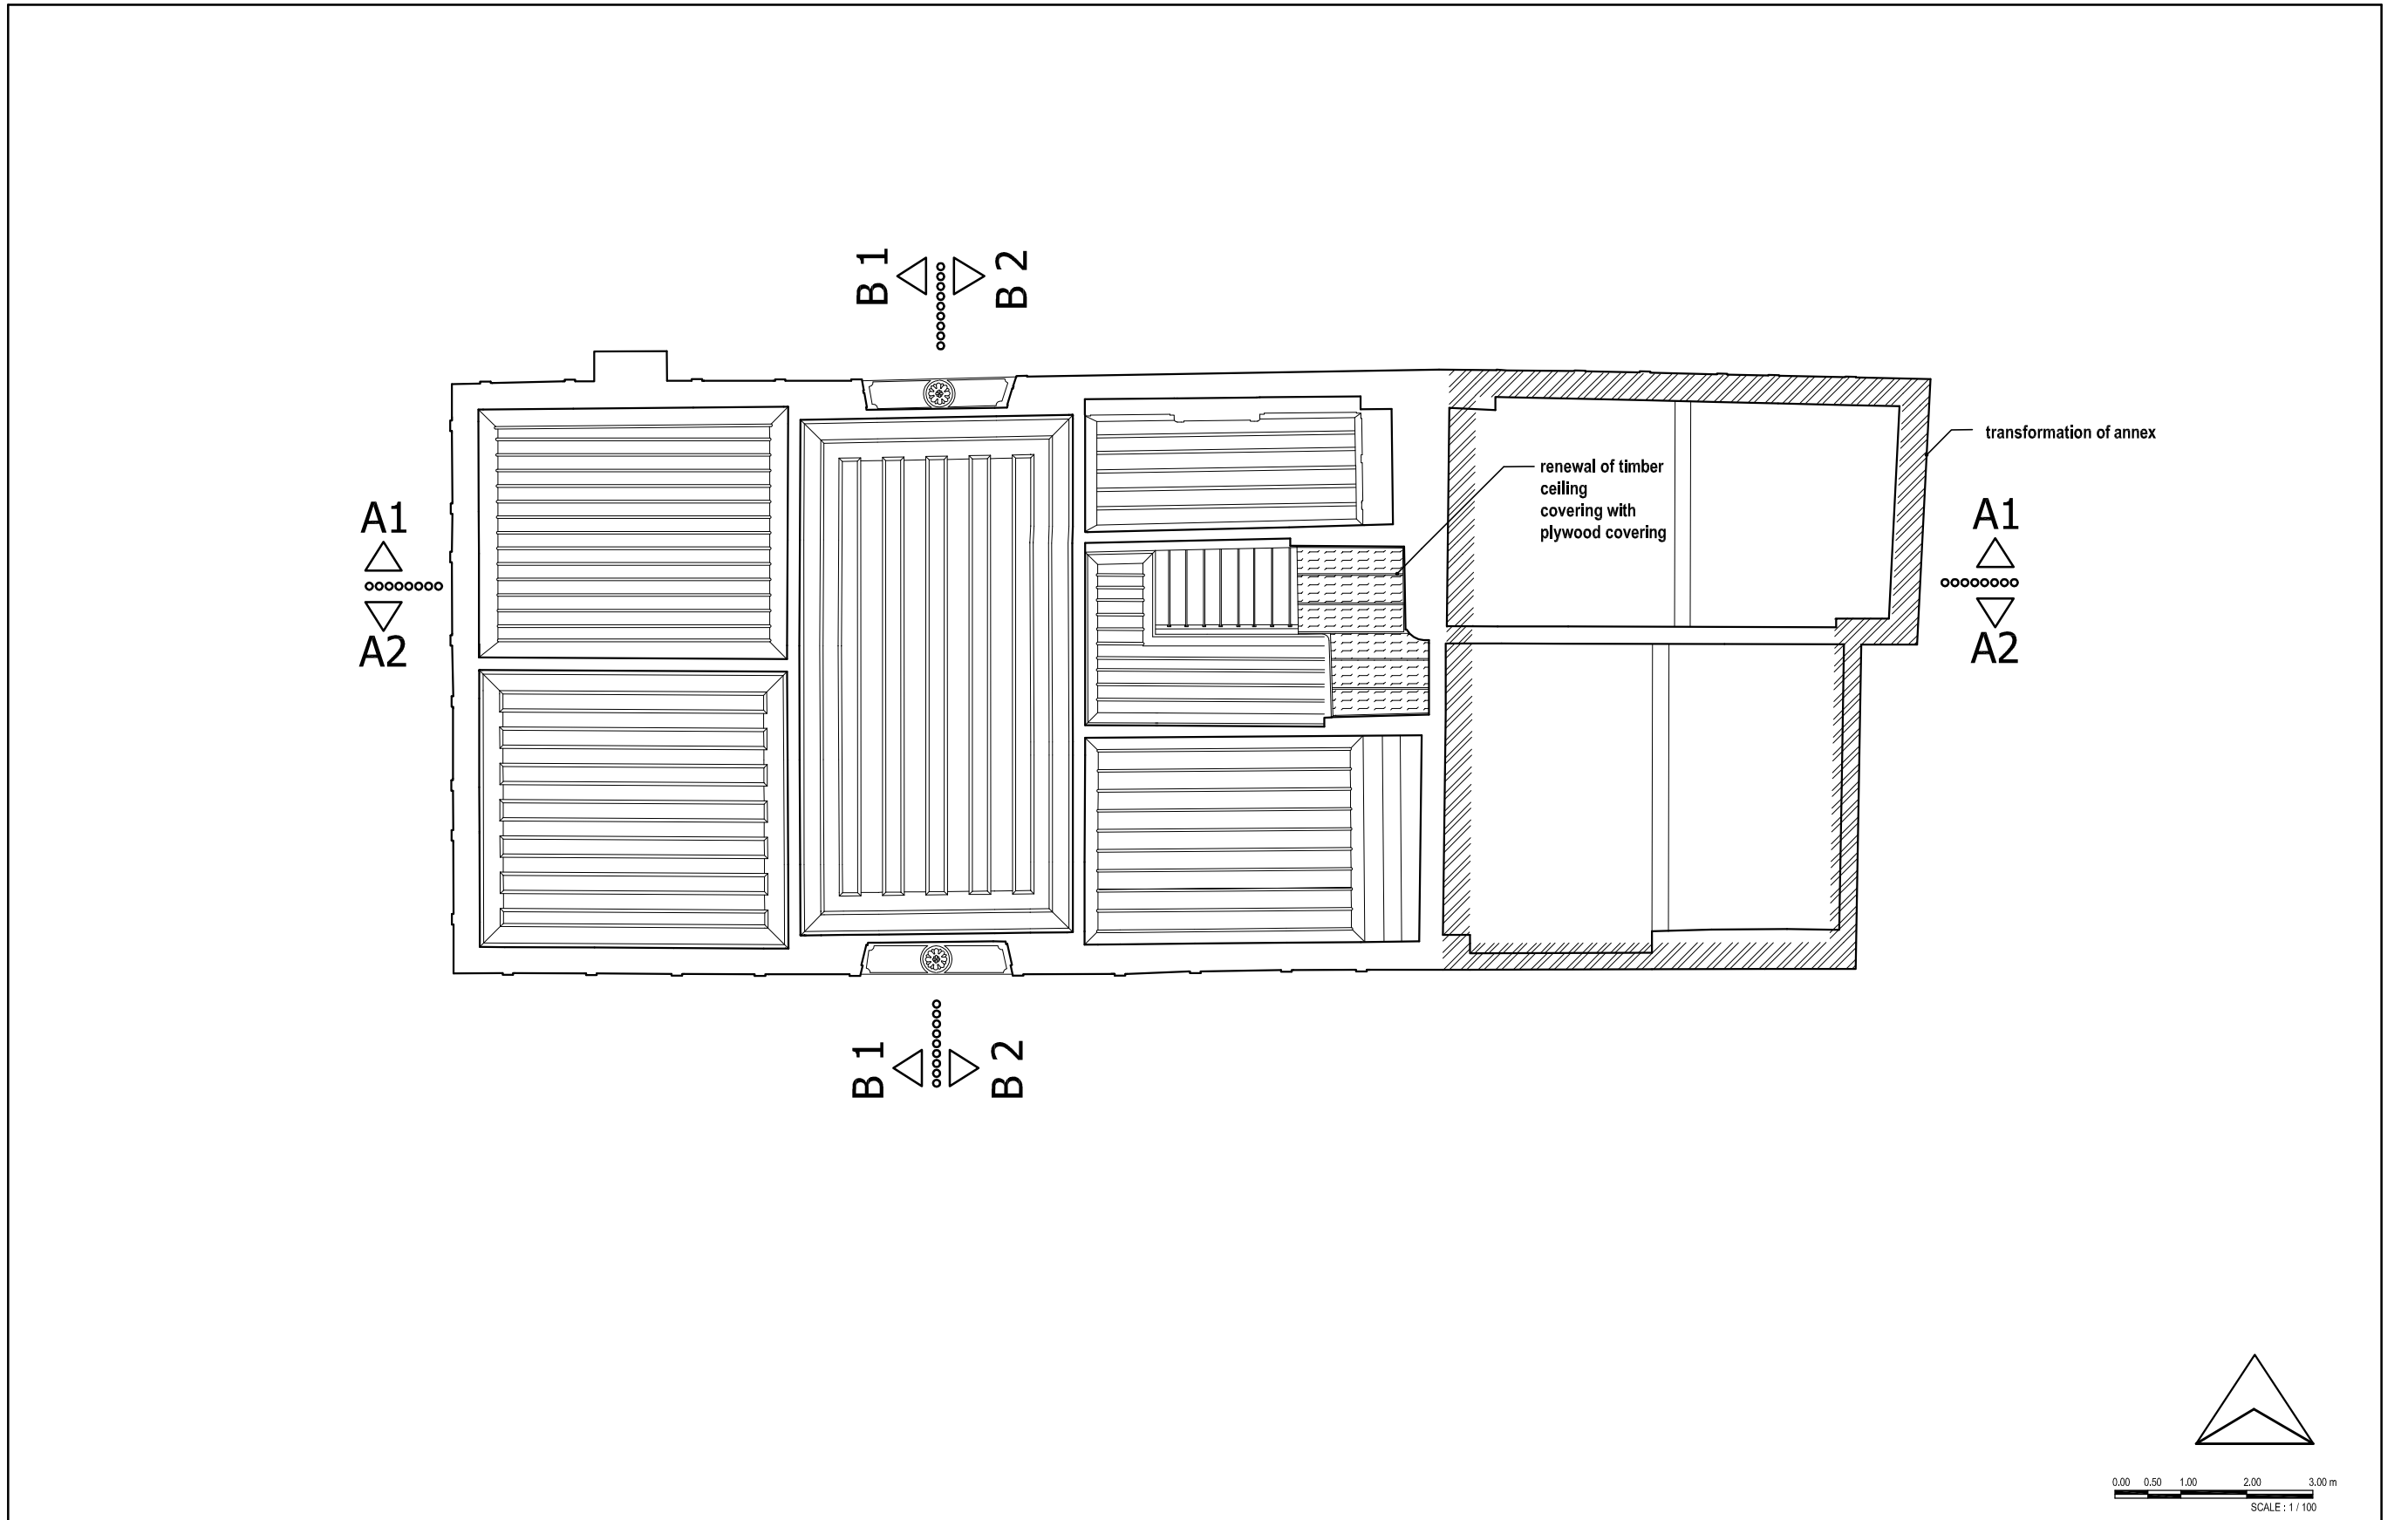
Analysis of Alterations- Ground Floor Ceiling Plan
